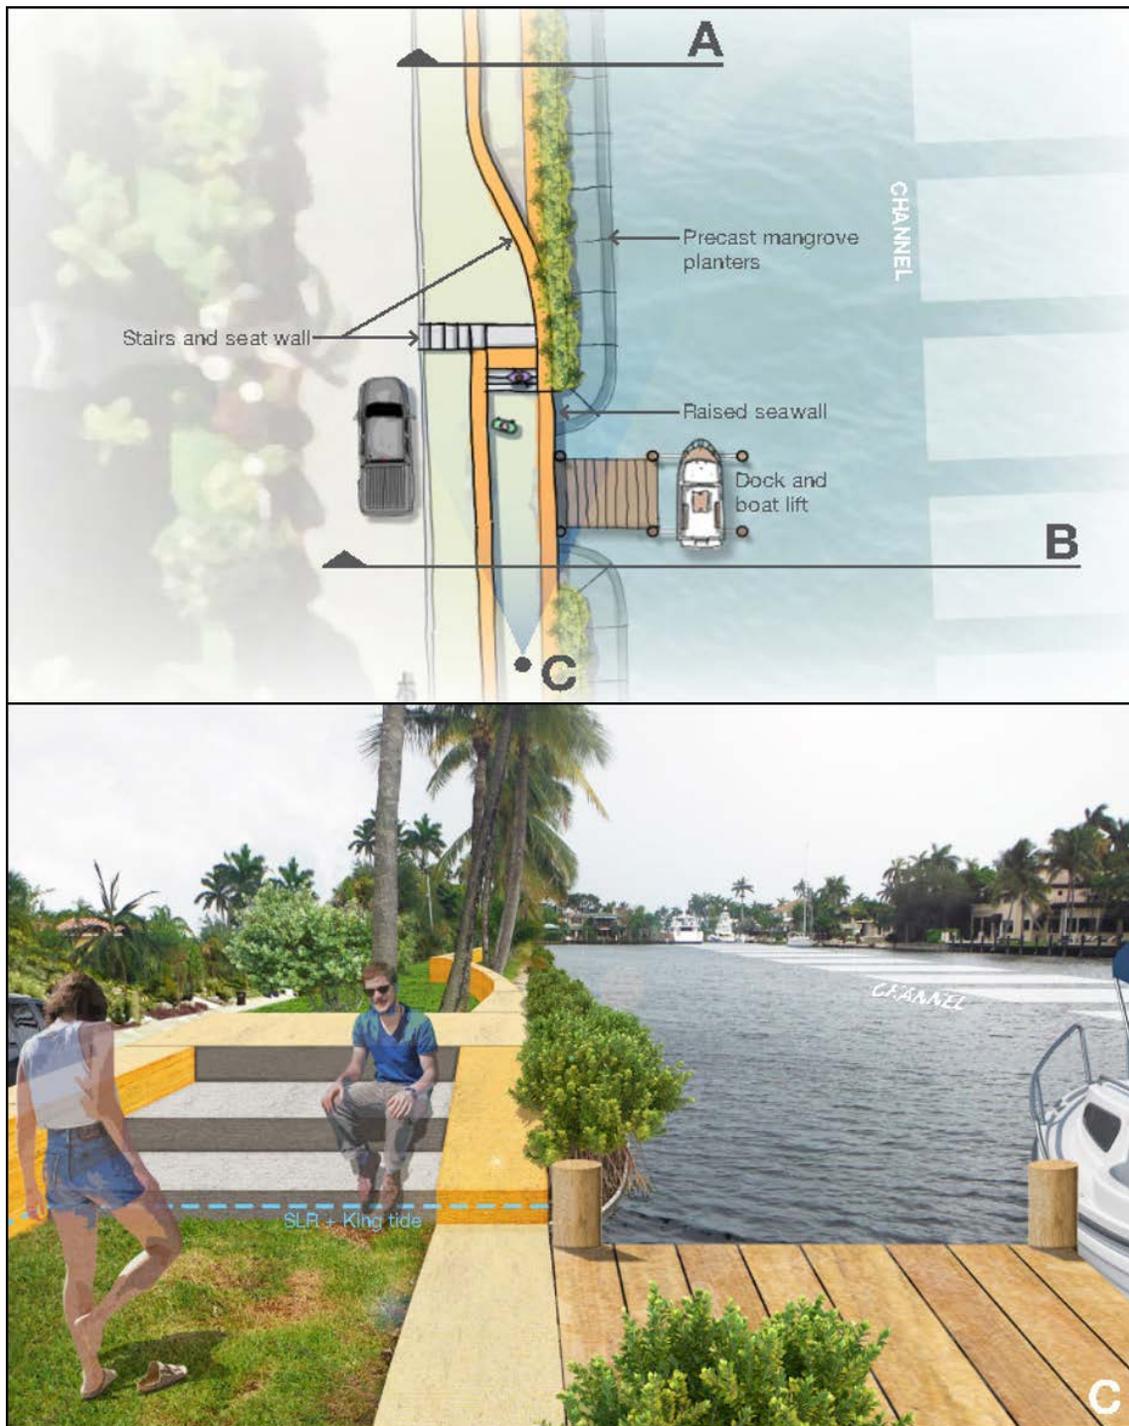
(a) Plan view and (b) perspective view of the terraced seat-wall design modification
